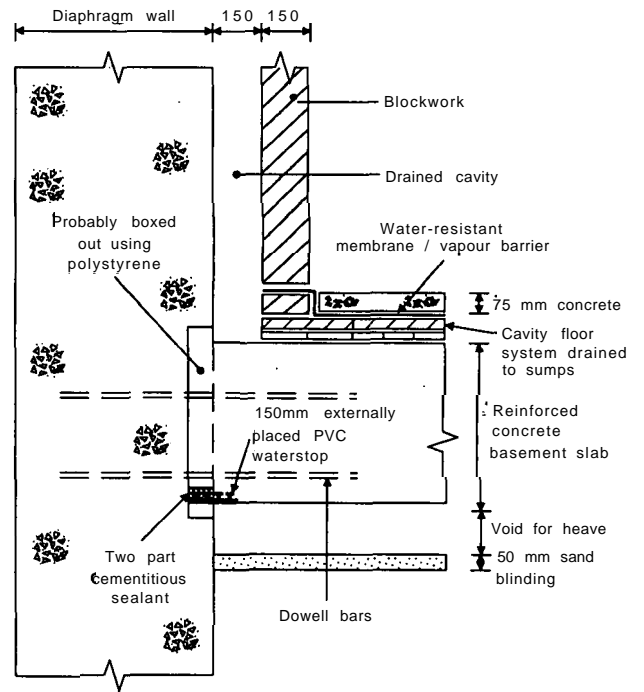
Detail of base slab / diaphragm wall junction. An example of Type C protection indicating special provisions at the wall / floor joint
